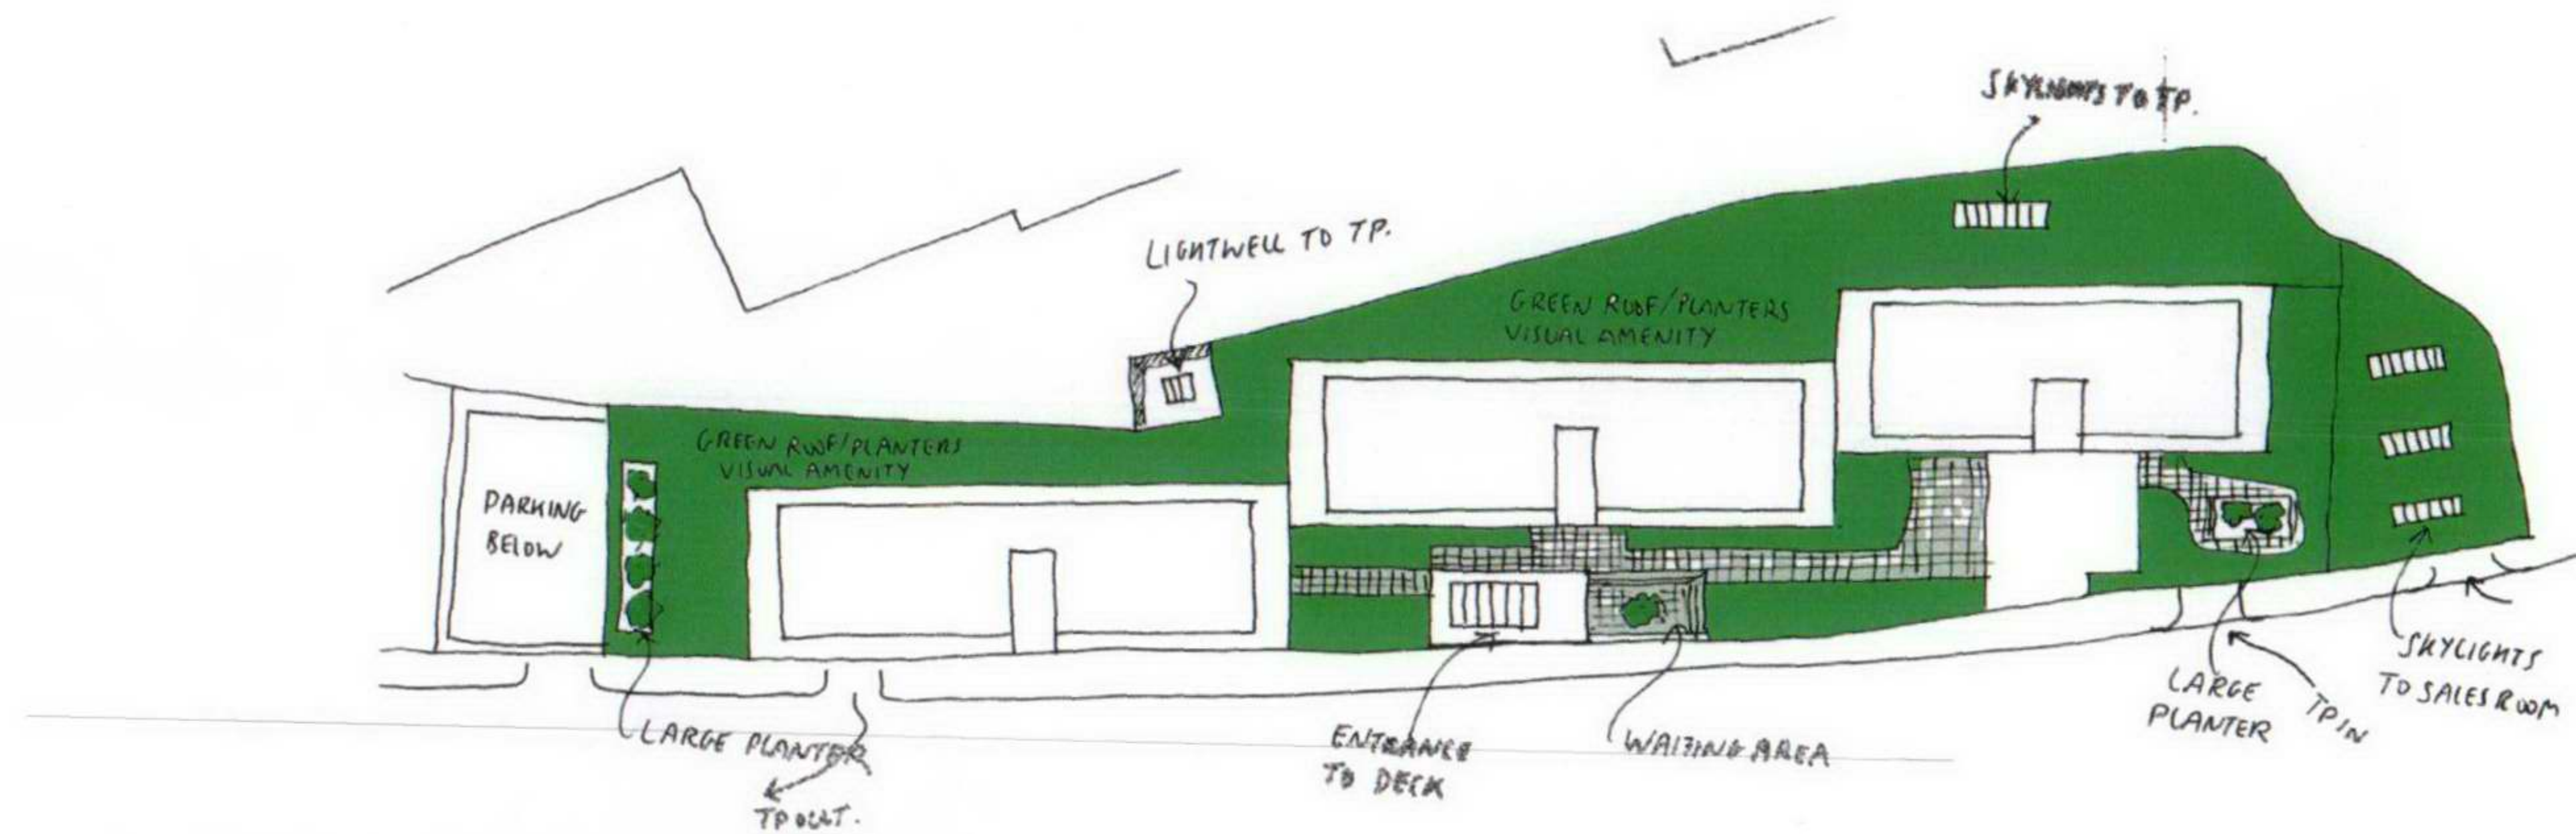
Sketch Plan of the Layout of the Blocks
